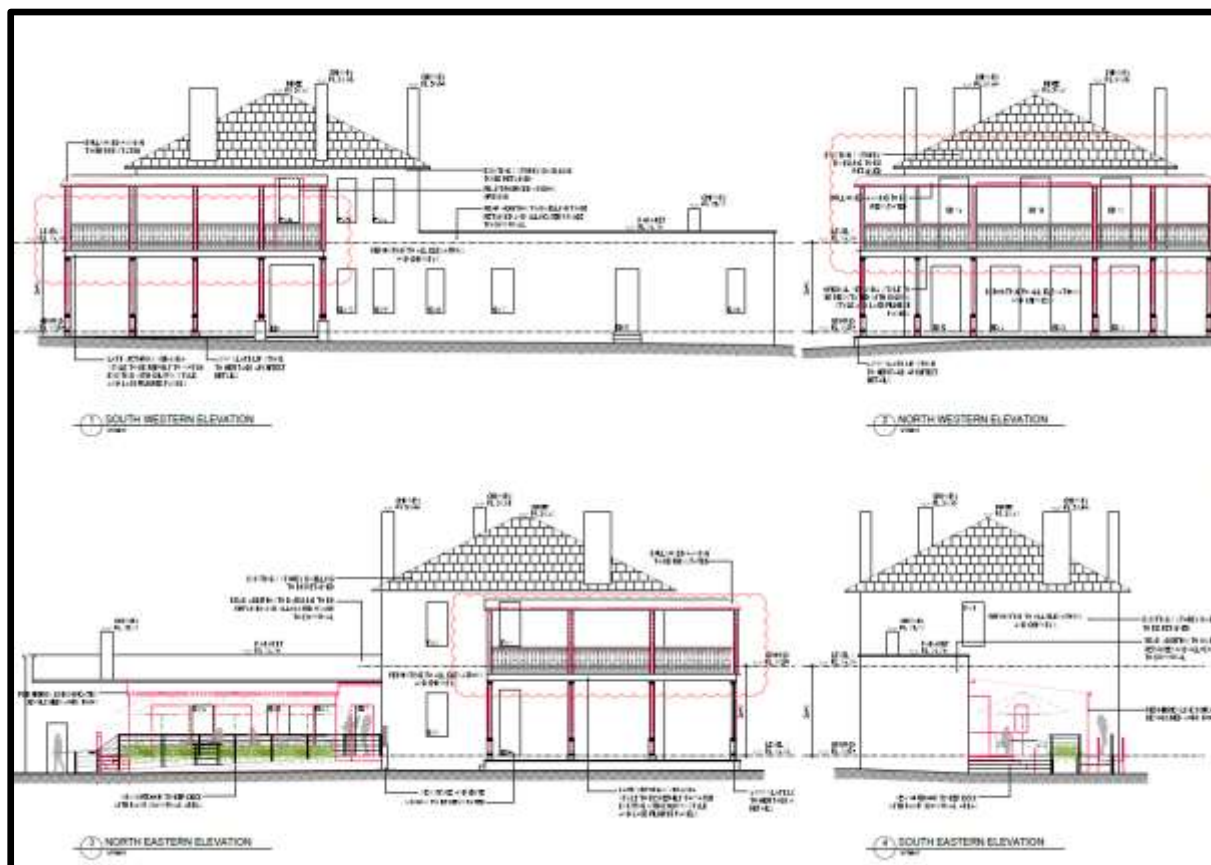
Detailed works proposed to “Sunnyside” (courtesy PBD Architects, DA200 Rev B, 2019)
